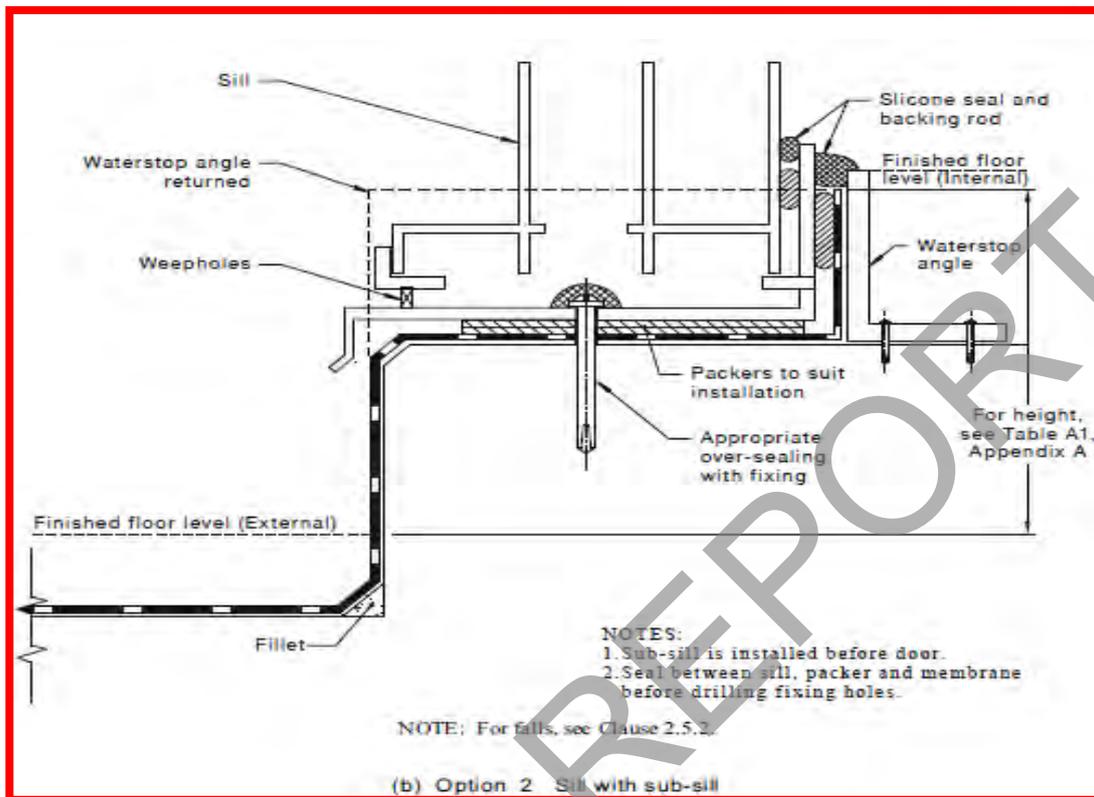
Figure 2.8 (in part) Typical Details Of Membrane Termination At External Opening Doors.
